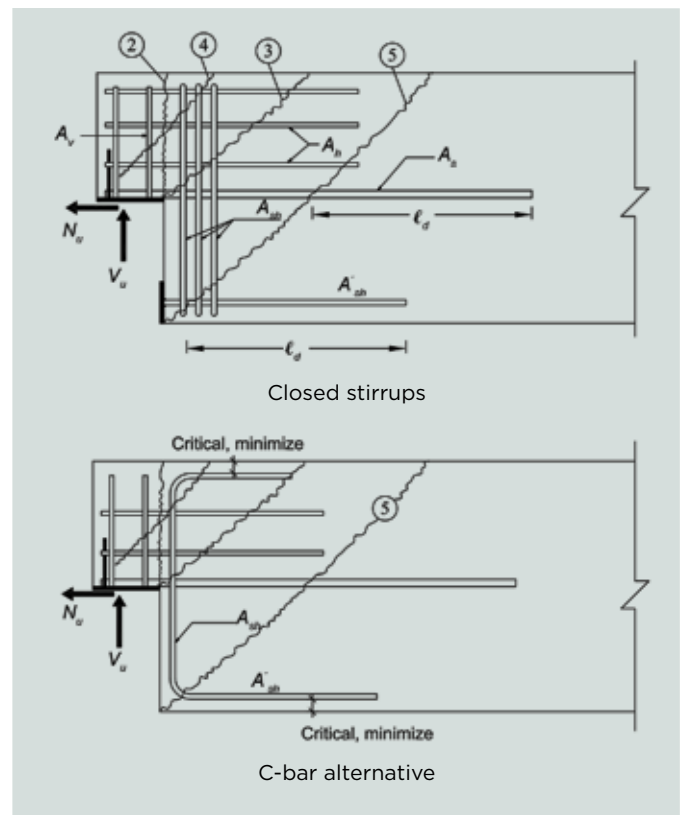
Potential failure modes and required reinforcement in dapped-end connections.
